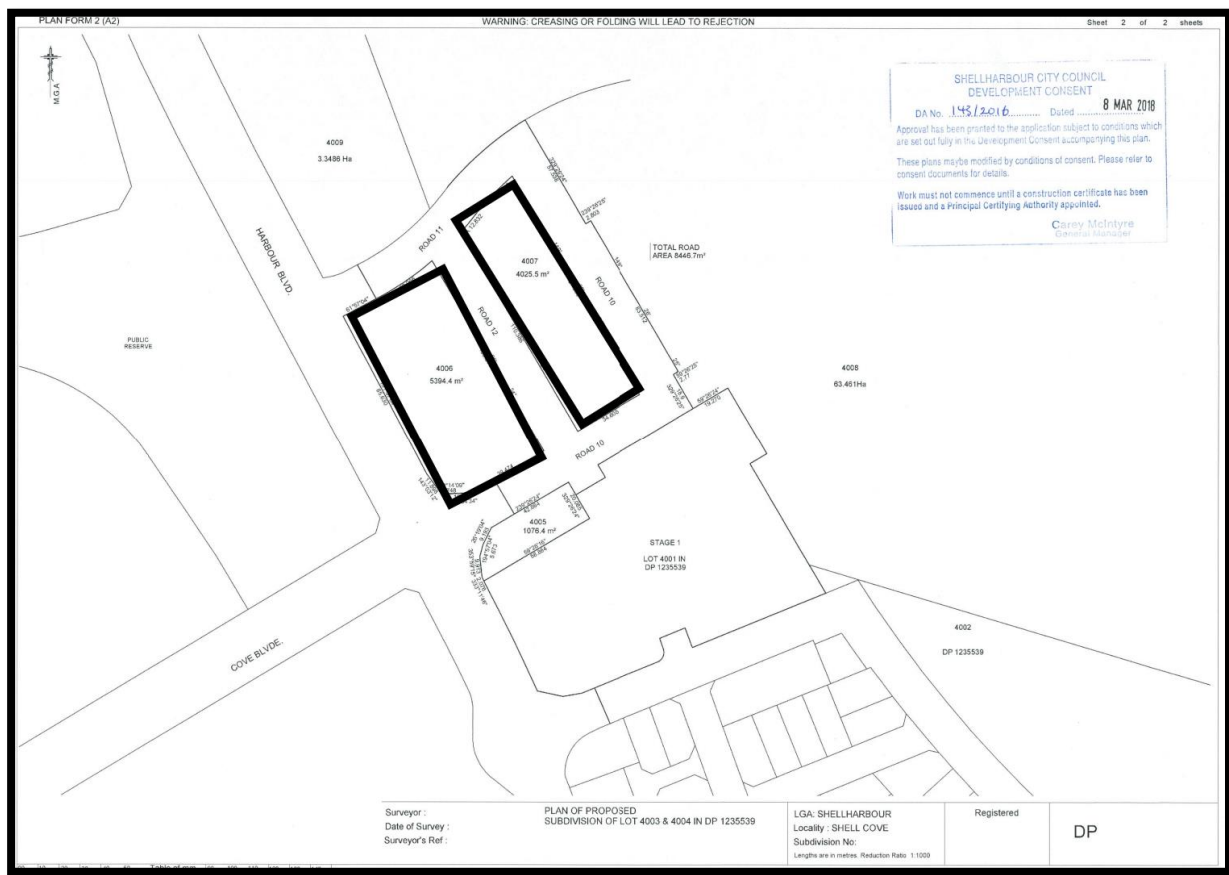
DA0143/2016 – Approved subdivision plan (application site outlined in black).
